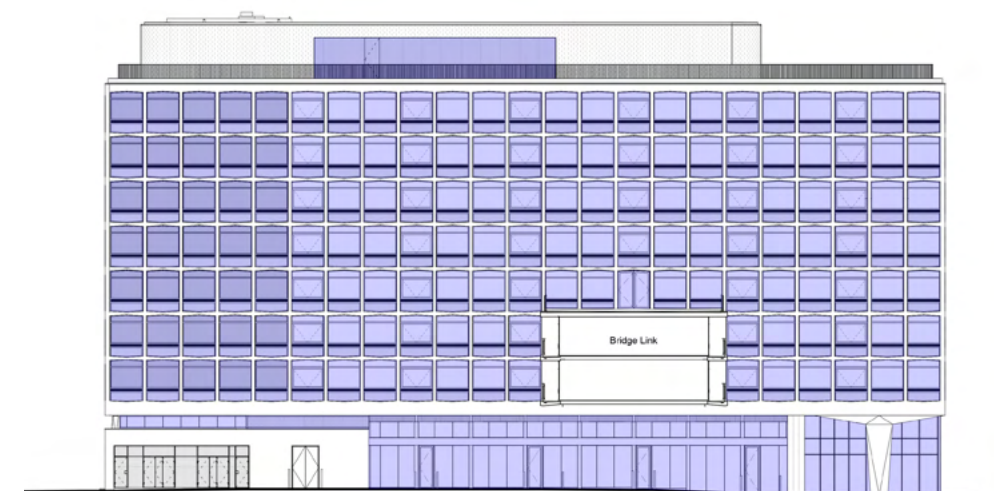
Kingsway East Elevation - MAT 06 location
